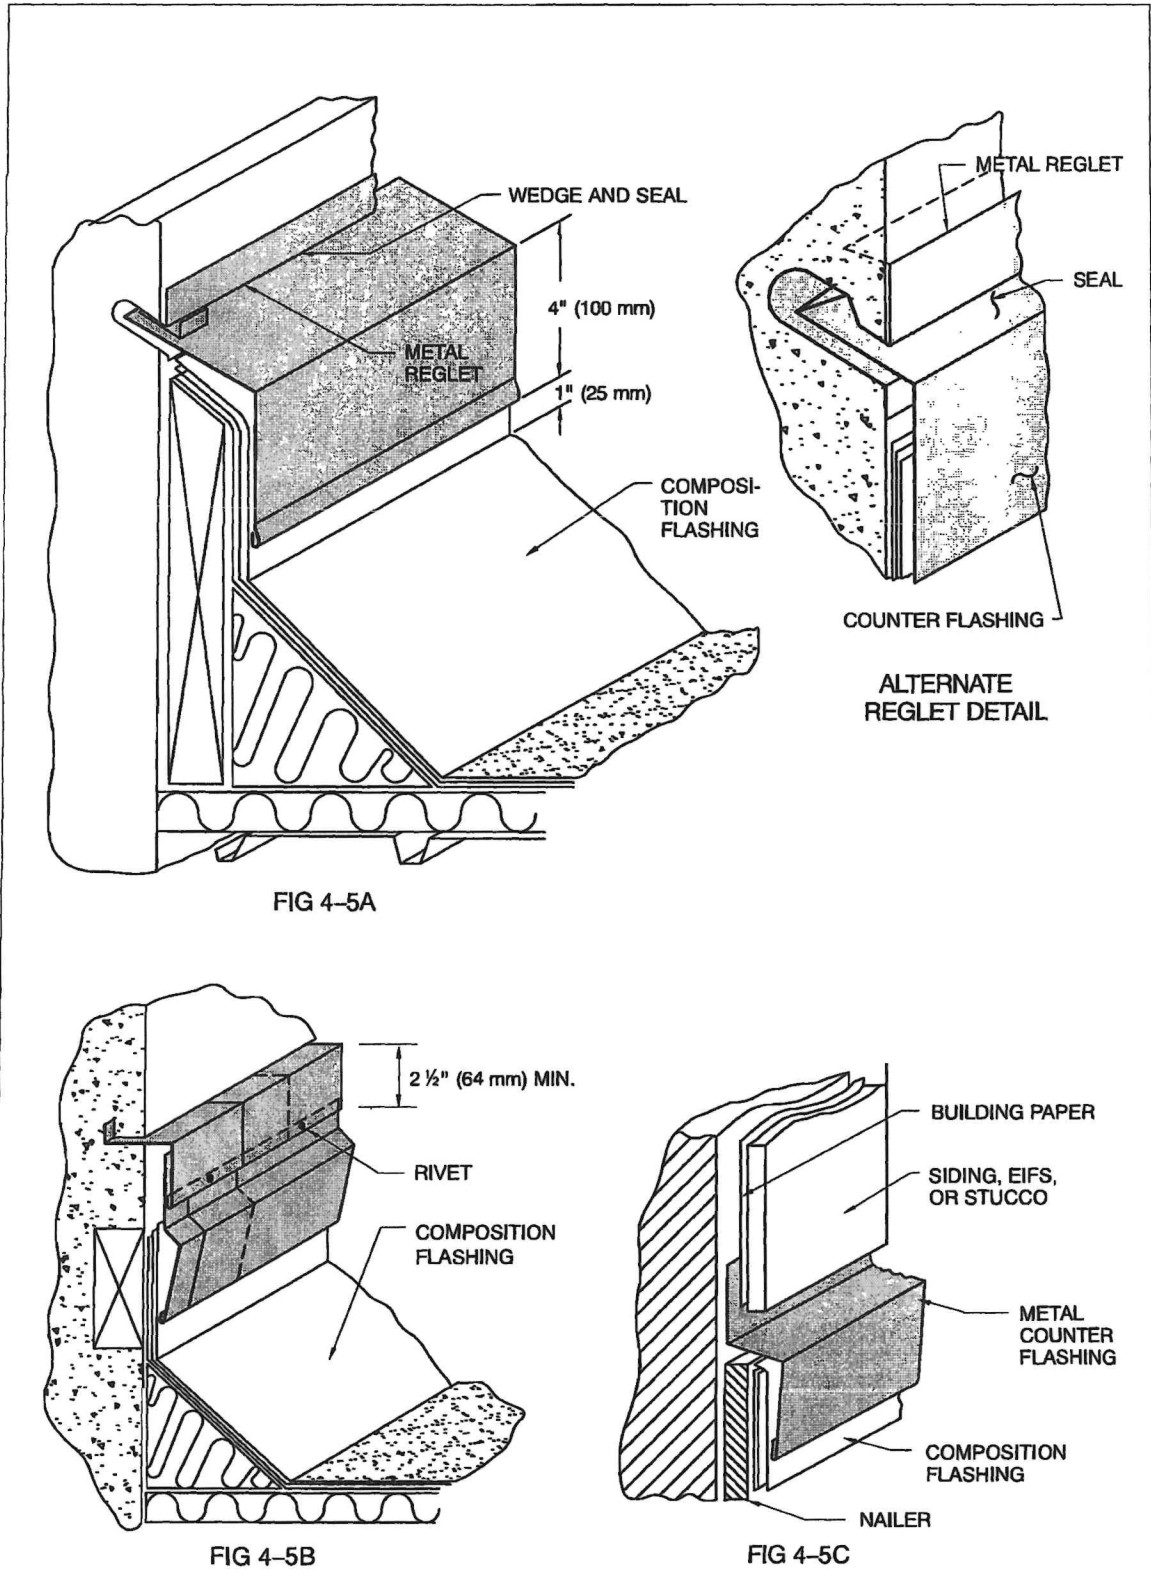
COUNTER FLASHING SYSTEMS — INSTALLATION
